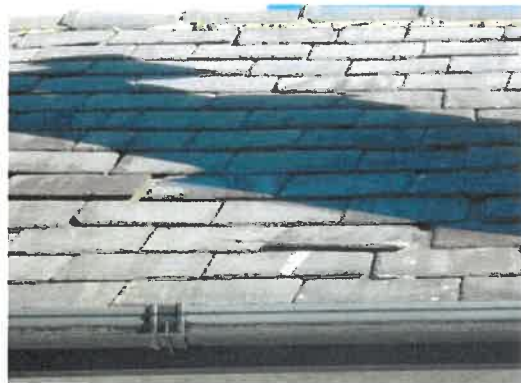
southern pitch of zone 2 roof. Plate 13. southern pitch of zone 1 roof
